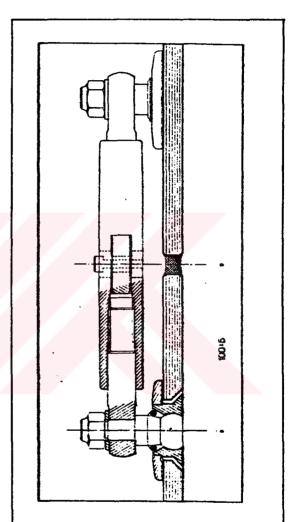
Section through 'H' assembly which supports glazed elevation.Glass, with silicone joint.
